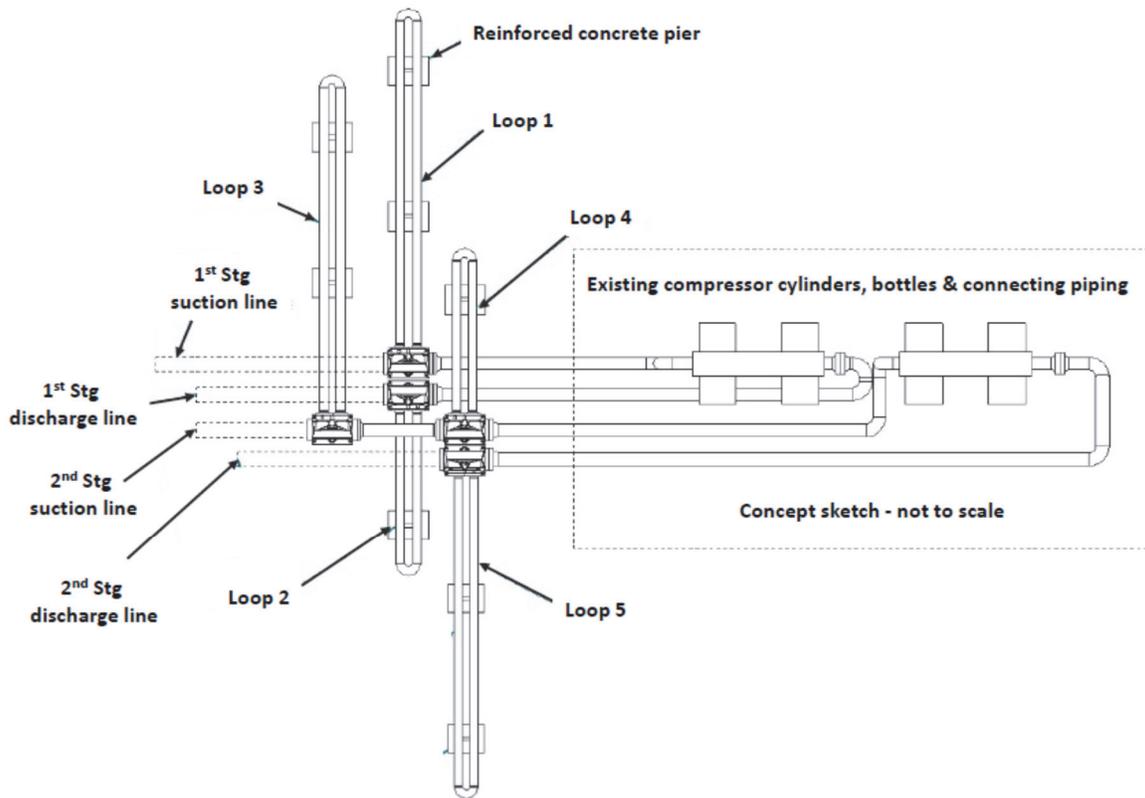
Sketch of proposed PAN Filters for an existing 2-stage compressor system
